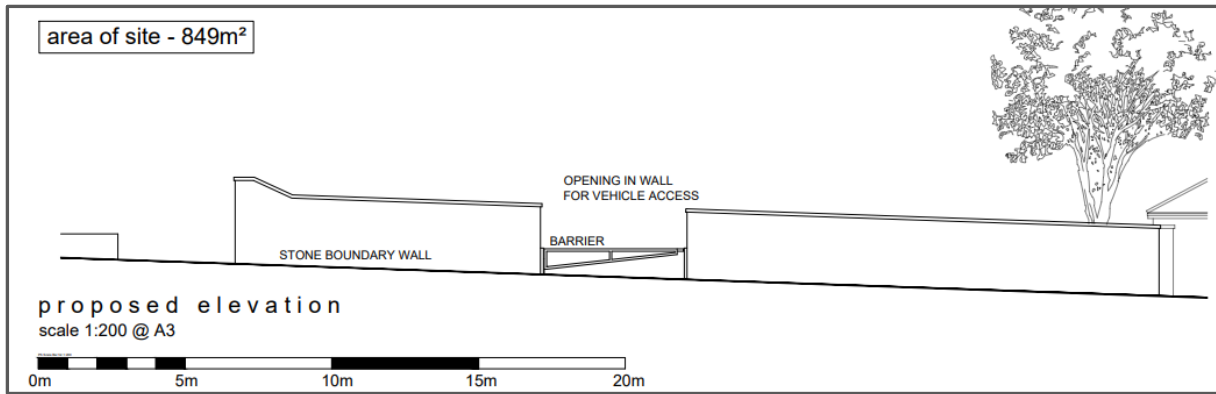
Extract from Proposed Site Plan 2024\_0074-02 Rev B
